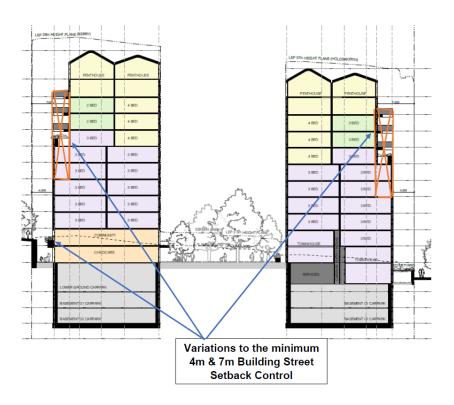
Extent of Building Setback Variations to Holdsworth Avenue (Building to the Right) and Berry Road (Building to the Right)
